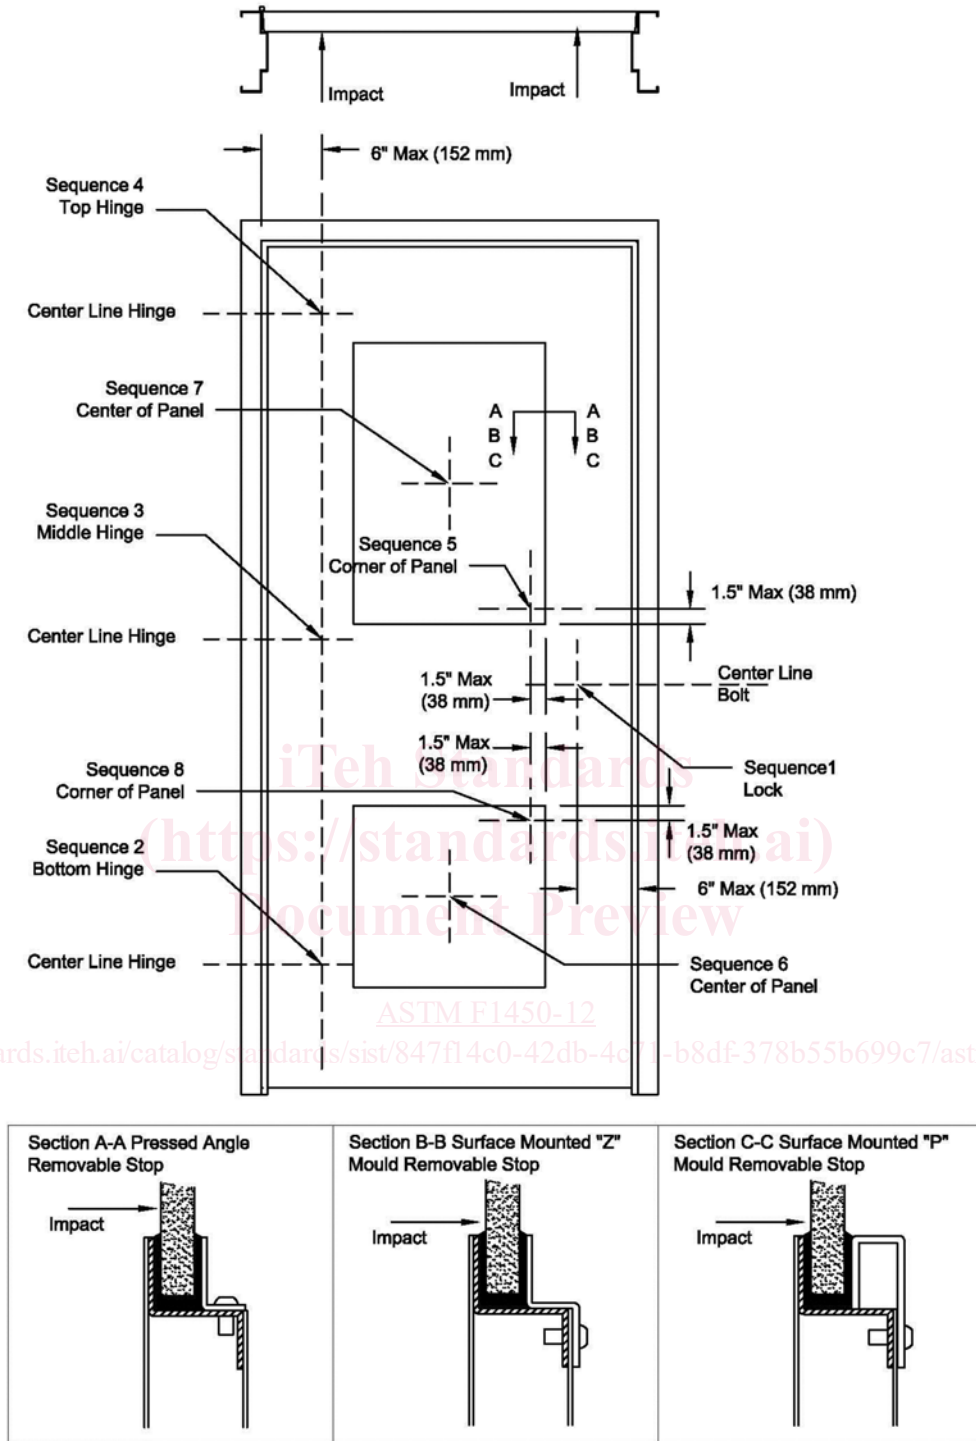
Test Assembly Door Elevation #2 Location of Strike Points Described in Table 2
